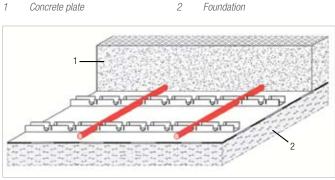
Floor panel reinforced with steel fibres; special construction heating pipes assembled to the clamping rails
